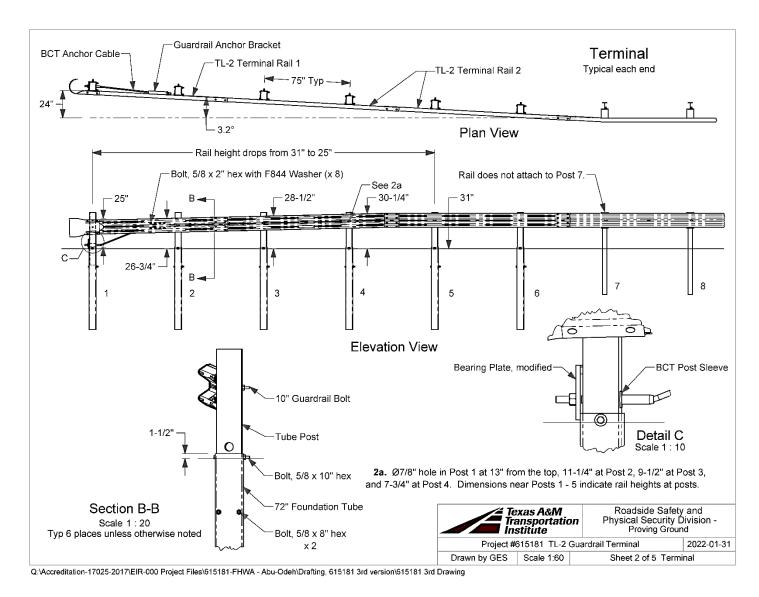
Details of TL-2 Terminal on MGS for Crash Test 615181-01-9.
